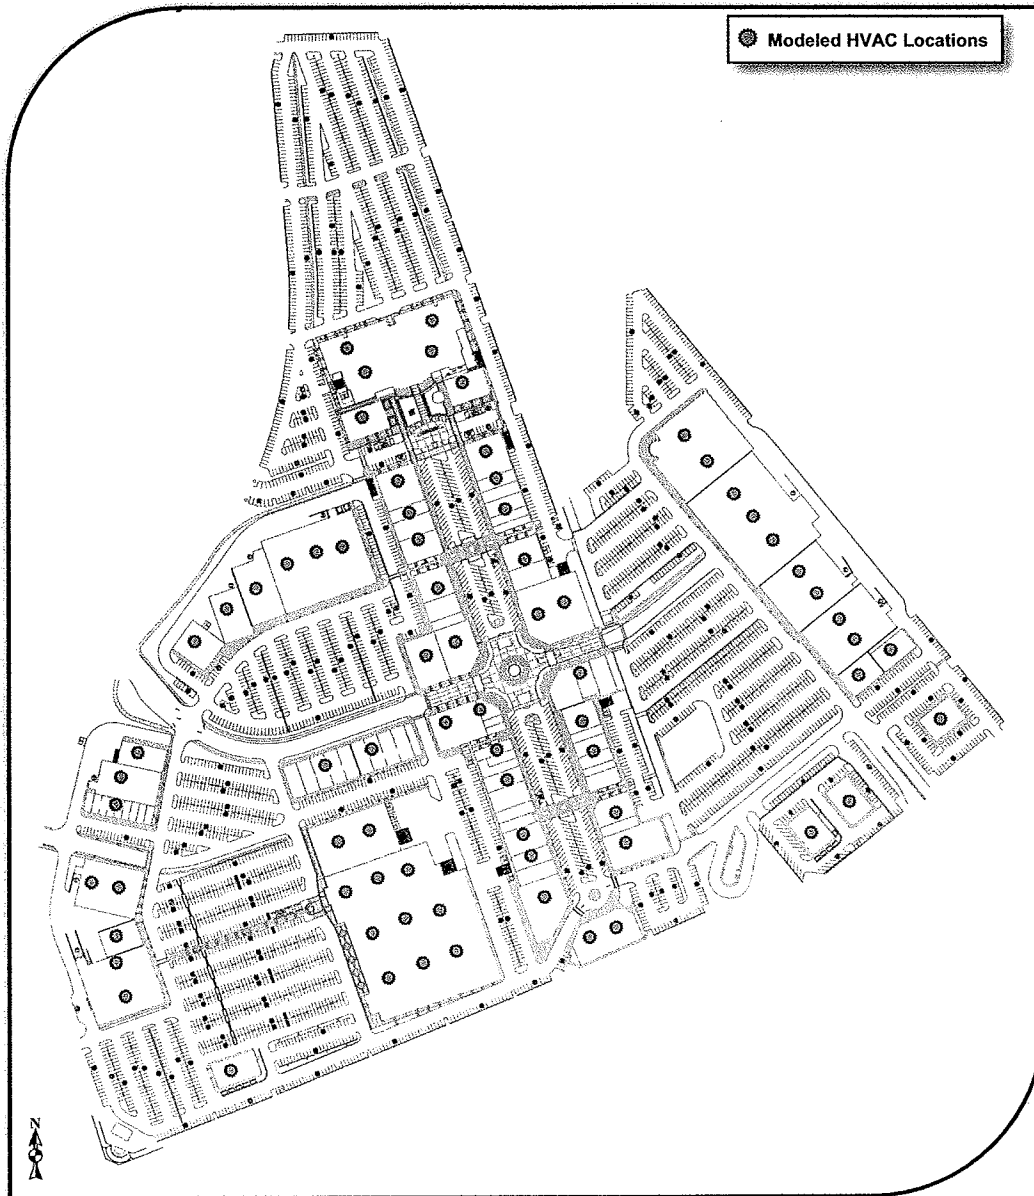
Proposed HVAC Locations for Draft Sub Area Plan Alternative (ISE 1/08)
